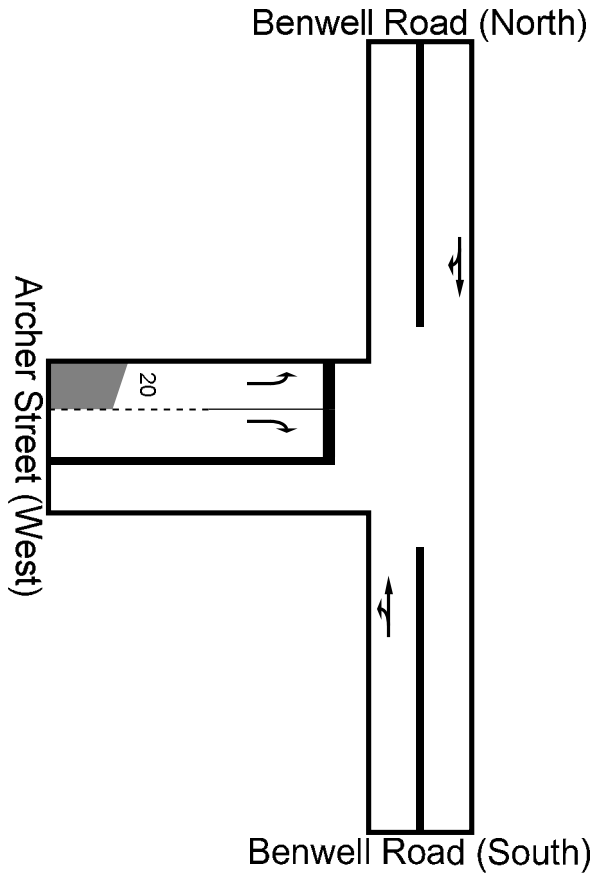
Benwell Road / Archer Street Intersection Layout - Signalised
